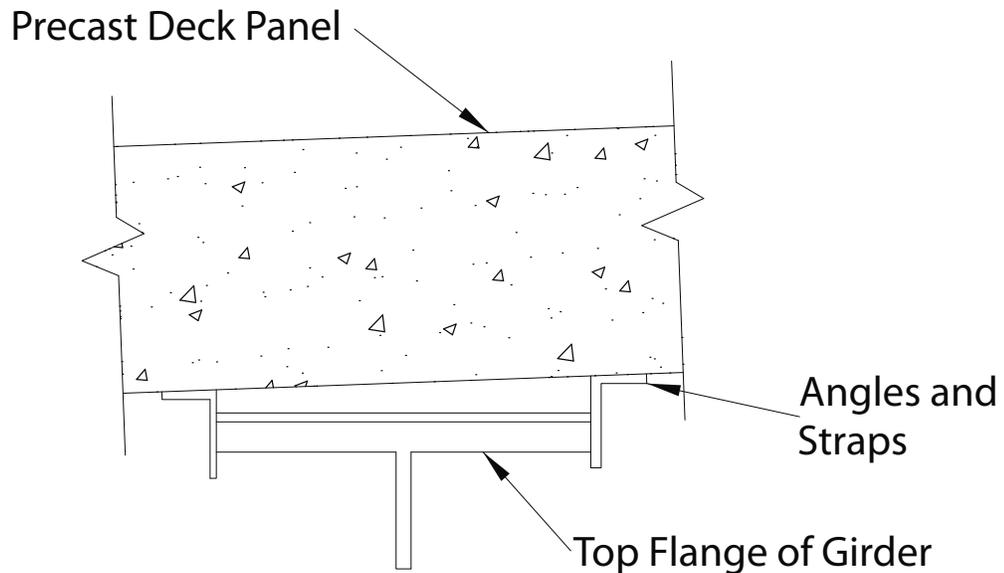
Leveling and haunch forming system similar to Skyline Bridge.
